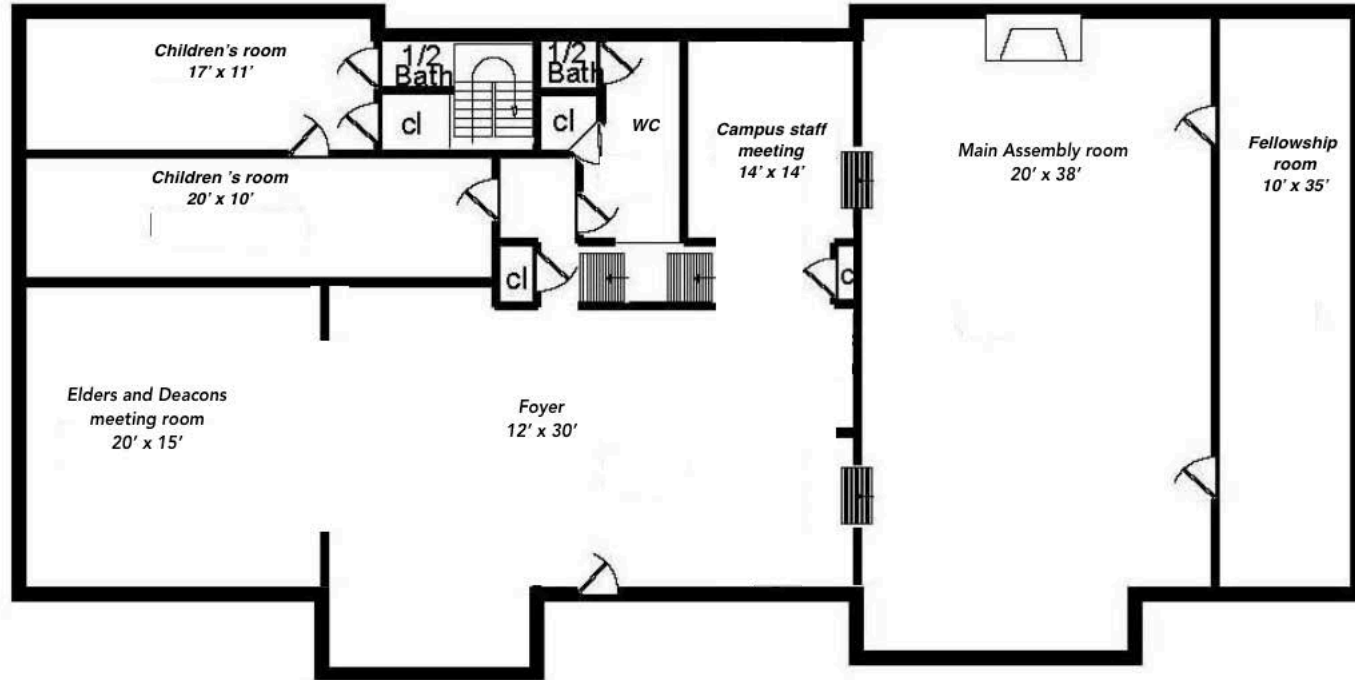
Exhibit E: Floor Plans of 713 West Ohio, dated February 12, 2018
